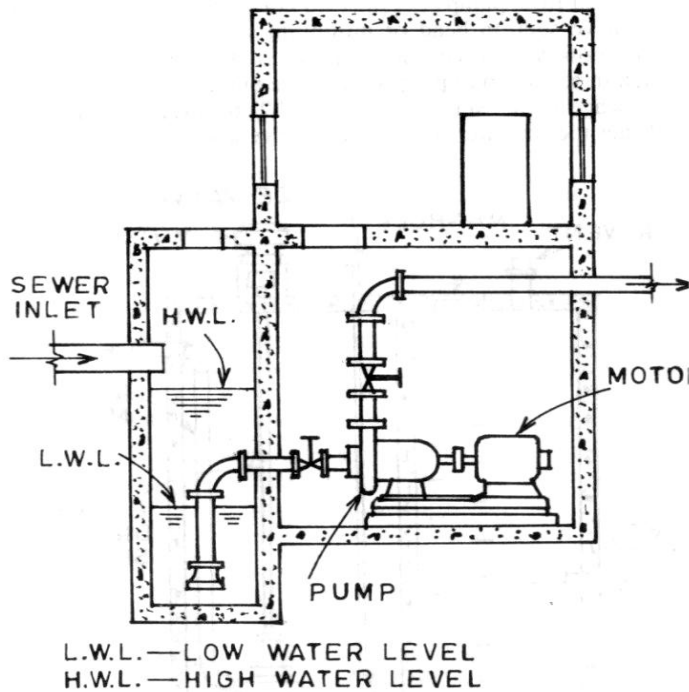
Centrifugal pump with horizontal shaft installed in a dry well or dry pit.
